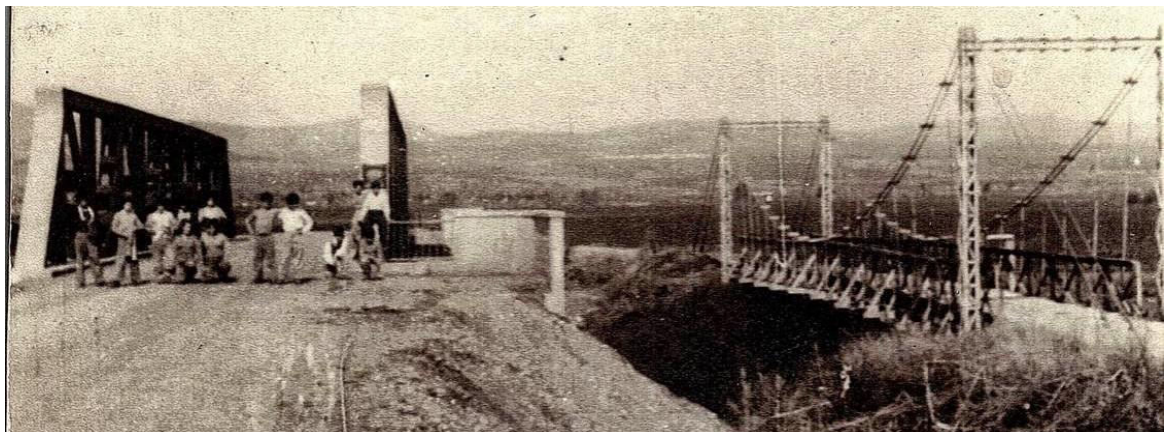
Historic picture (1956) of the new bridge replacing an old British suspended bridge from 1927.
